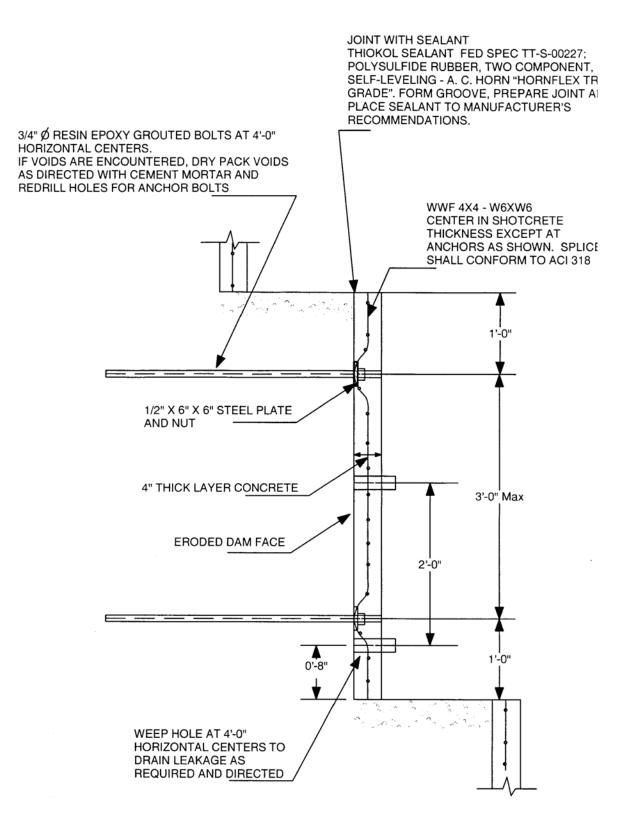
SHOTCRETE INSTALLATION DETAIL
